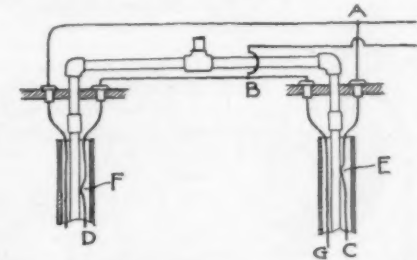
Showing Circuits on Fixtures not provided with Insulating-Joints.
